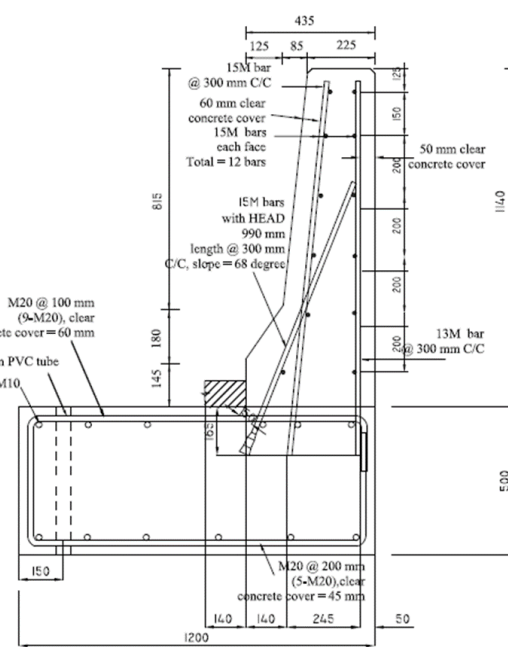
Cross-section of specimen S-3 for interior portion of the barrier resting over thick deck slab
